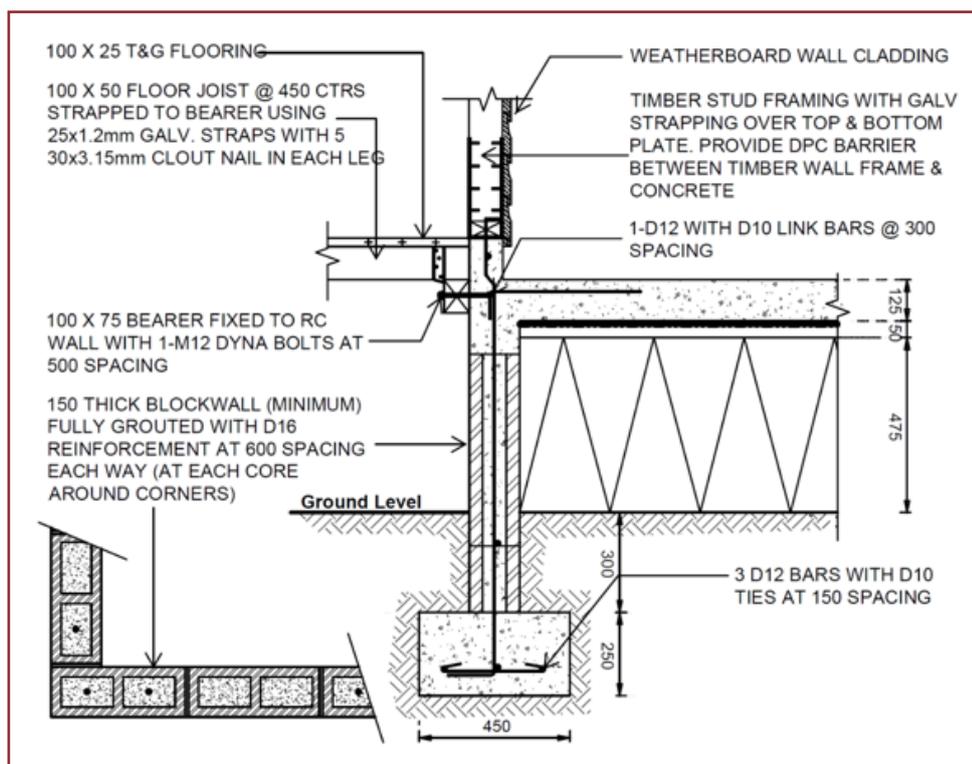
Concrete masonry wall connections (Source: Fiji Rural Housing Unit standard drawings)
